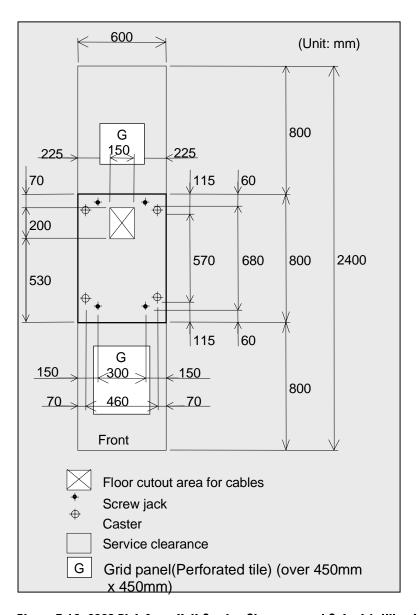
9960 Disk Array Unit Service Clearance and Cutout (millimeters)
